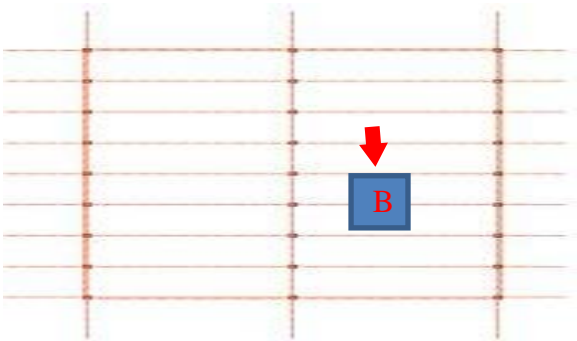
Floor plan of departure hall with good spatial (Structural flexibility)
